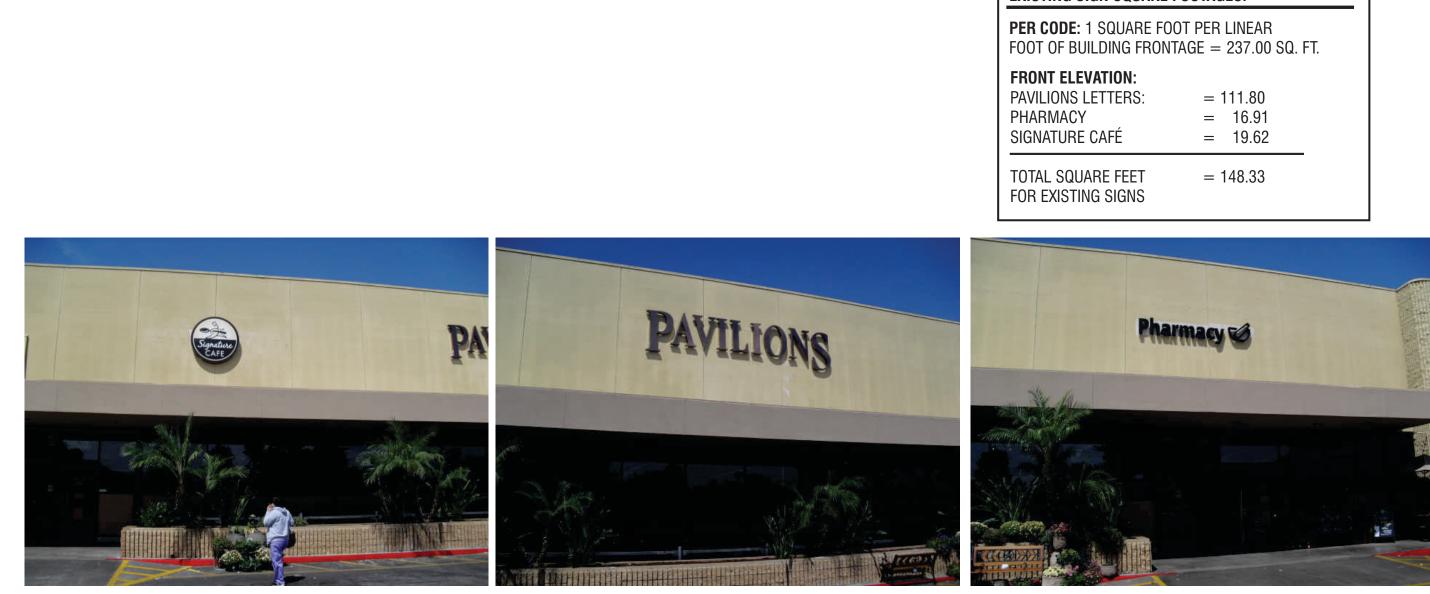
PHOTO VIEW OF EXISTING BUILDING SIGNS ON FRONT/ EAST ELEVATION
